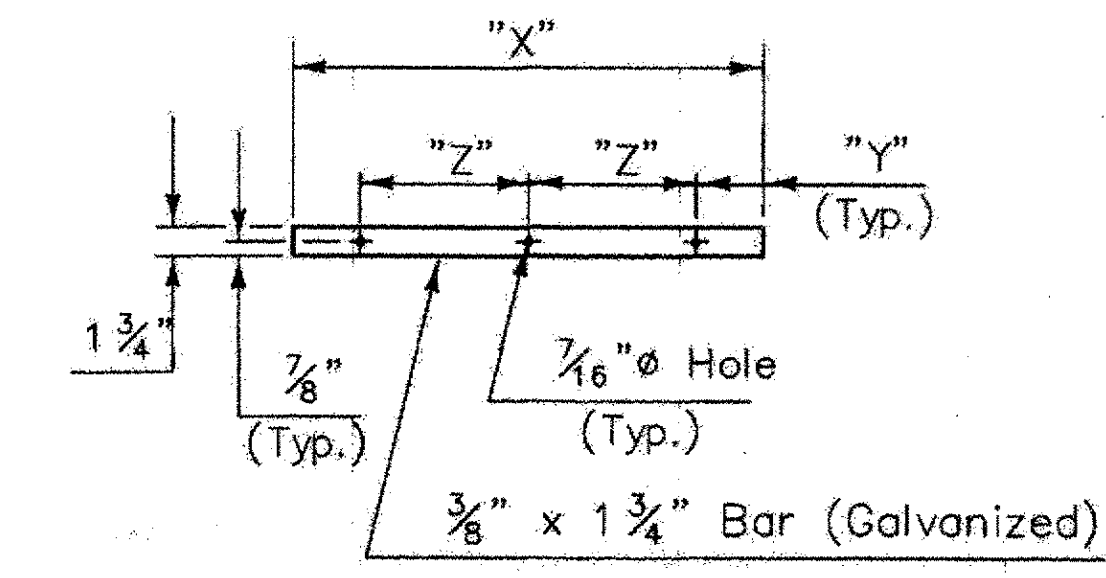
DETAILS FOR EXTENDING DRAIN TROUGH AND SUPPORT PIPES
